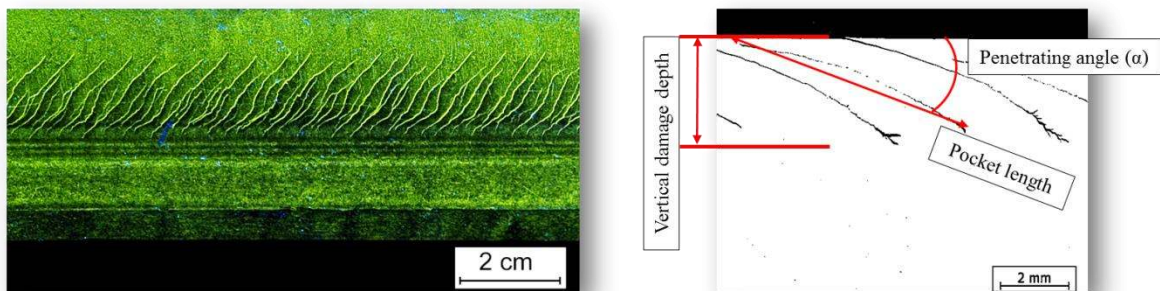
MT inspection of Head Check (left) / Cross section of Head Check (right) [2]
